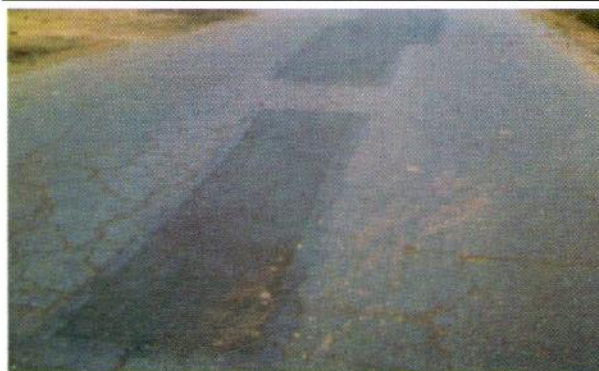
Bird's eye view of rehabilitated road section. Note the existence of medium severity alligator cracks around rehabilitated area
